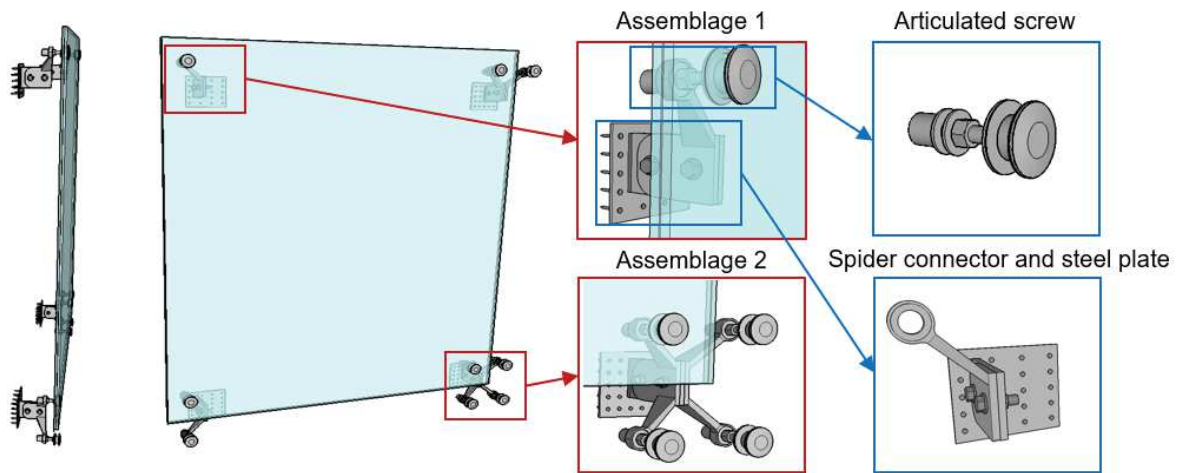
Detailing of a glass panel to be located within level 1 and 2 (upper left corner) of the Skeleton Building.
